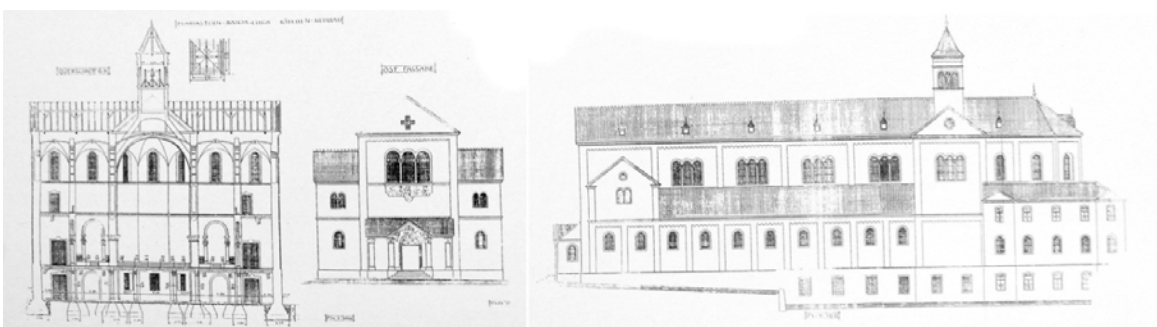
Church of The Resurrection of the Blessed Virgin Mary, second church; cross section, eastern entrance and northern side elevation views.
